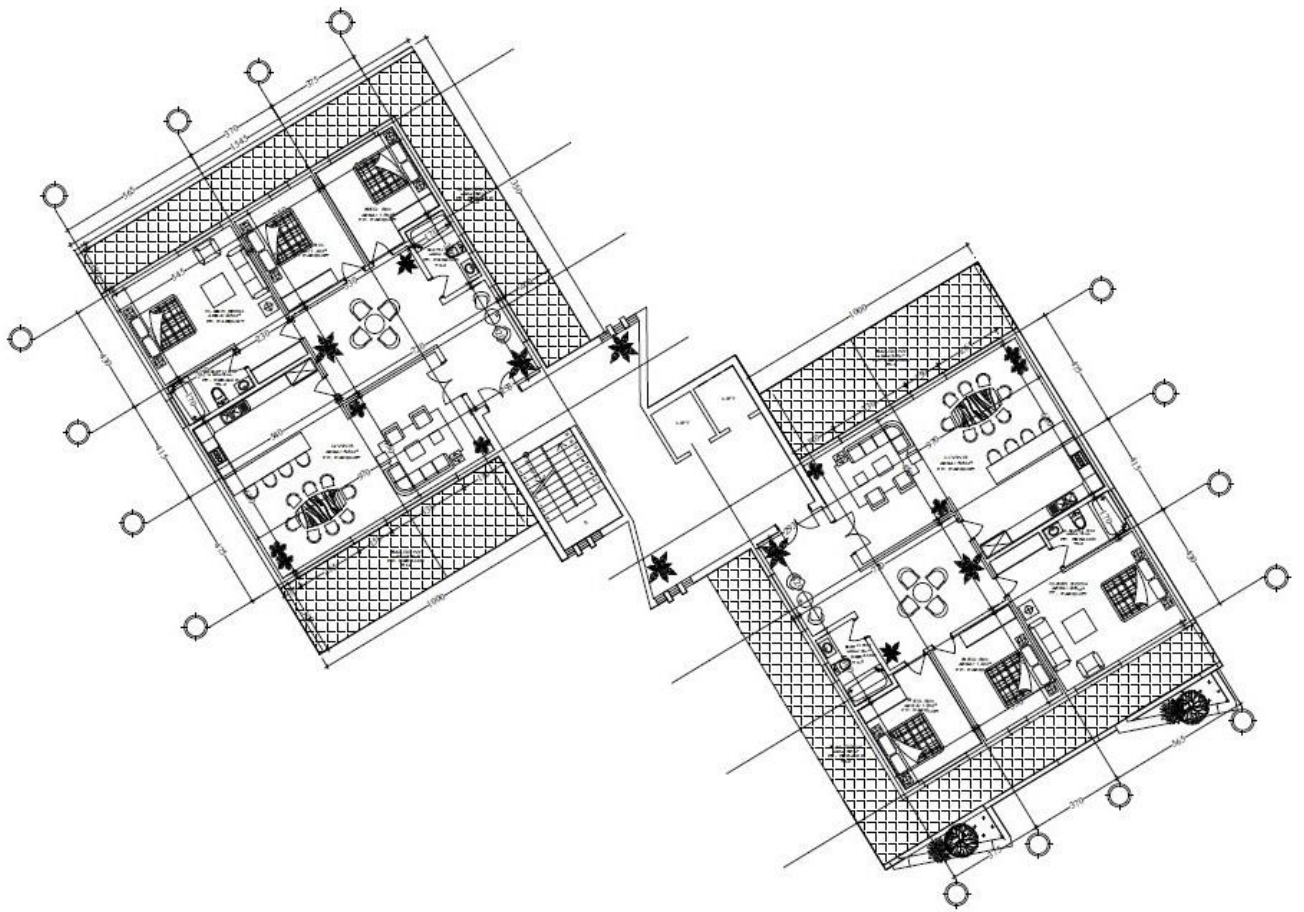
Floor Plan of 2nd, 3rd 5th, 6th, 9th, 11th, 12th 14th 15th of the proposed integrated vertical farming apartment building
